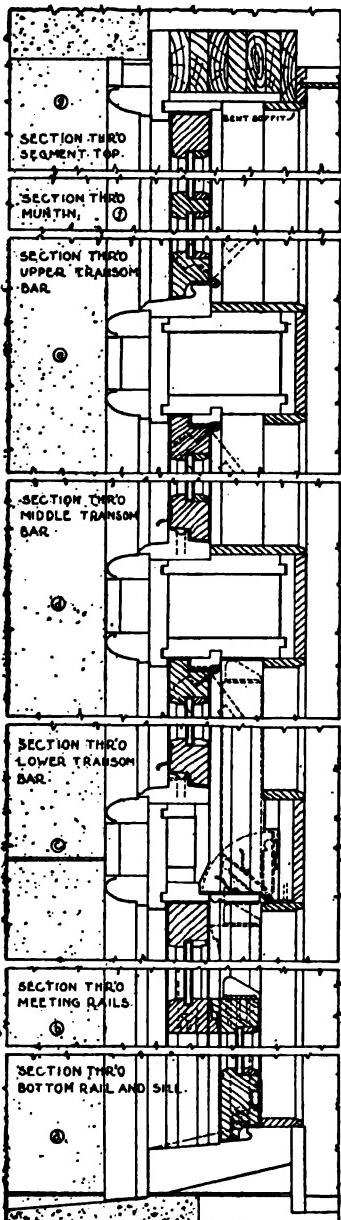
Dining-Room Window-Frame, Double-Hung and Transom Sash. University Club Building, New York City.
